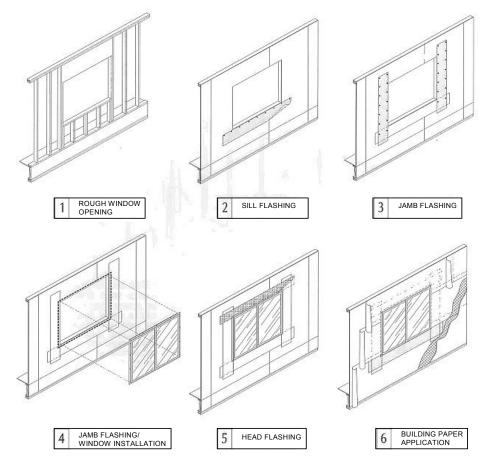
Installation procedure taken from the manual entitled *Nail-on Windows Installation & Flashing Procedures for Windows & Sliding Glass Doors* by Robert Bateman, 1995.
